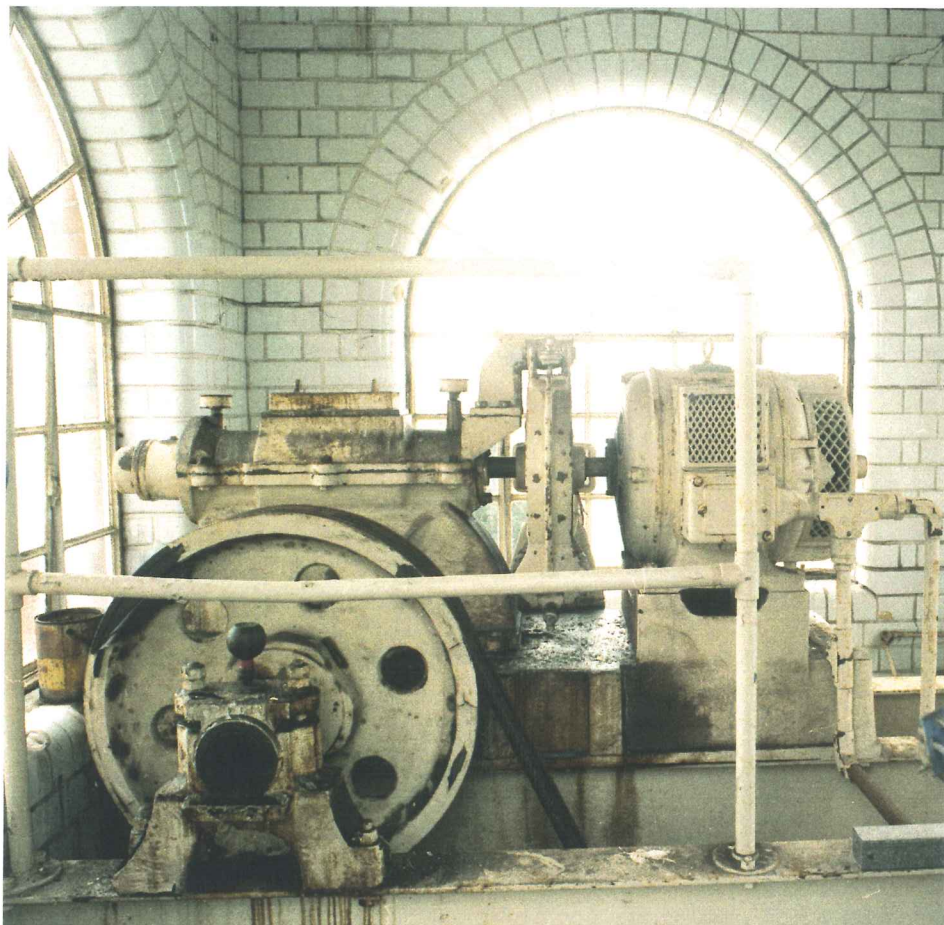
Hoist Mechanism In Cask Store Roof Tower
